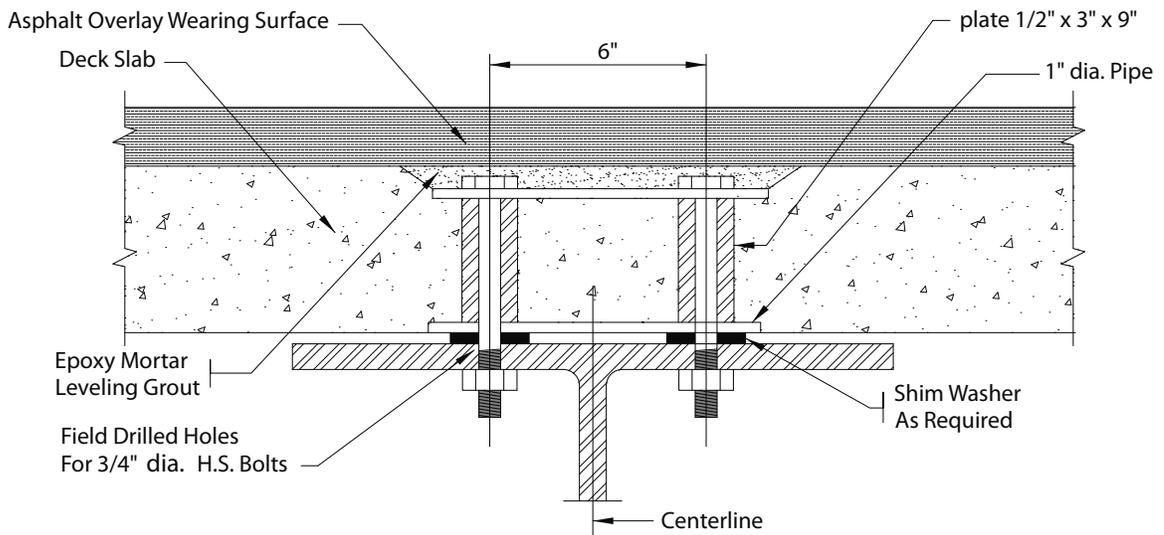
Bolted detail used in the NY Thruway Experimental Bridge.
